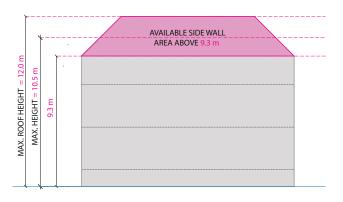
SIDE ELEVATION SHOWING MAXIMUM SIDE WALL AREA NO TRANSITION
